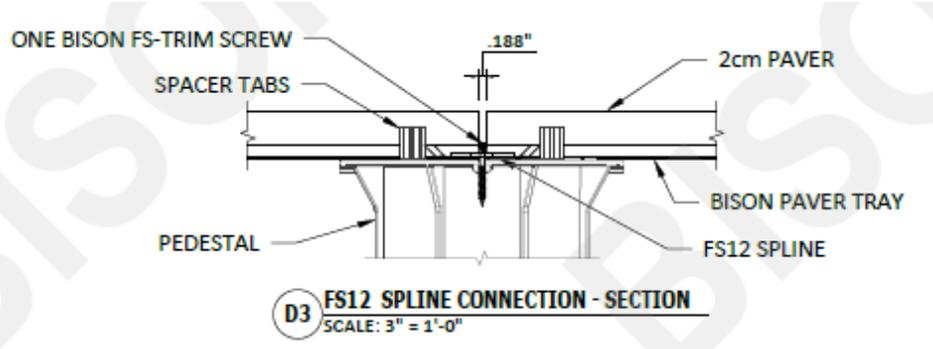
A – FS-12 SPLINE CONNECTION DETAIL FOR BISON 2CM PAVERS (SIMILAR TO CONCRETE / STONE SLAB PAVERS)
